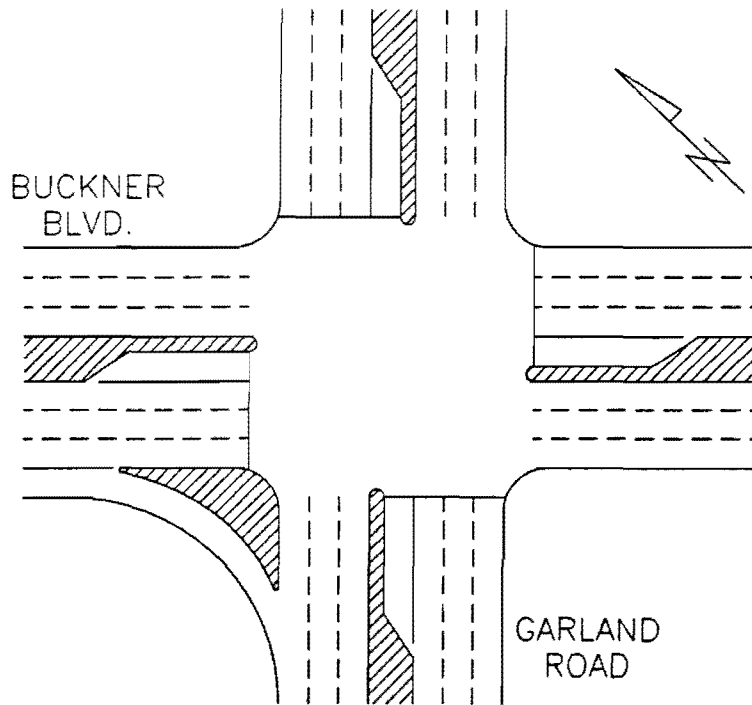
Garland Road and Buckner Boulevard, Dallas TX.
